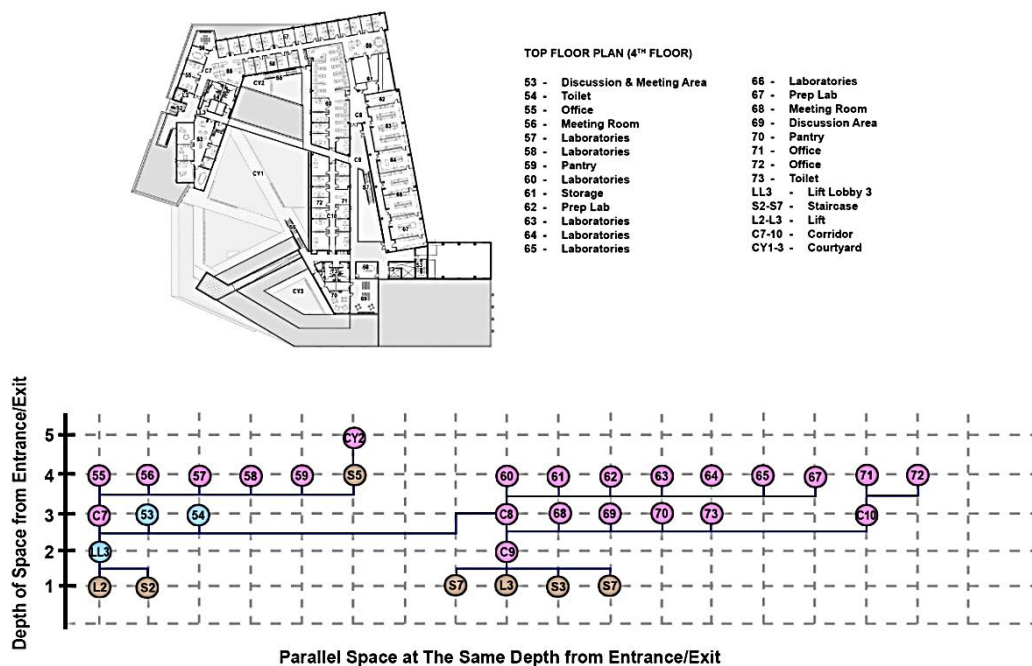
Top Floor Plan(4th Floor), Legend and Justified Graph showing Mid-Floor plan's circulation in NOAA Southwest Fisheries Science Center.
